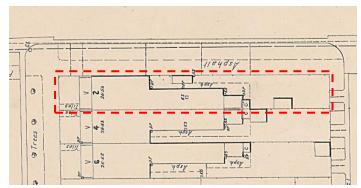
, 1895 MMBW plan showing original/early condition of 1 St Vincents Place Albert Park (Source: SLV)
